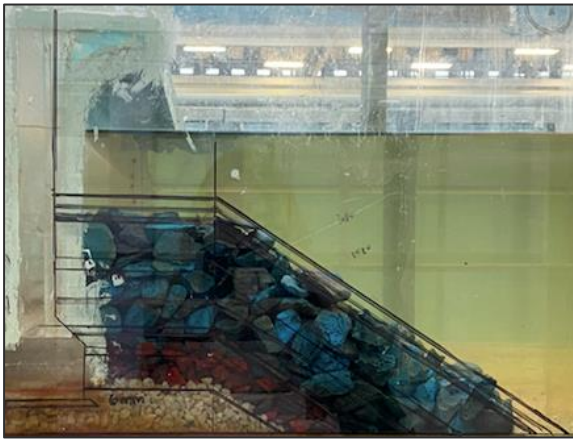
Test B3-18S before deformation of the rubble-mound structure
